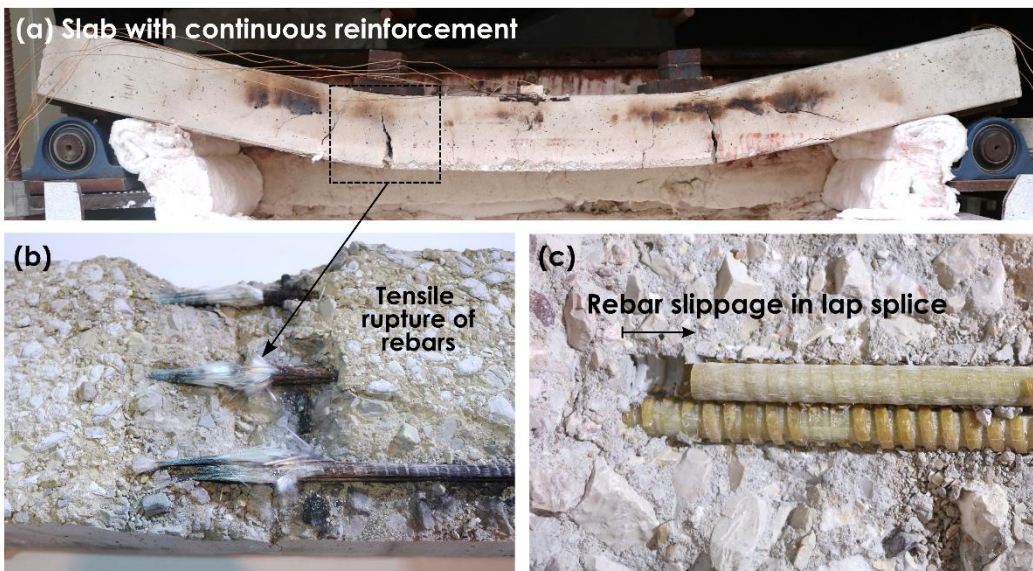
Post-fire observations of fire resistance tests on concrete slab strips reinforced with FRP bars.
